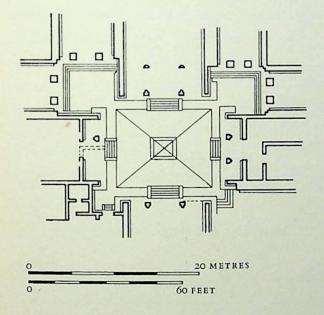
Atetelco, near Teotihuacán, dwelling group, c. 500. Elevation and plan
